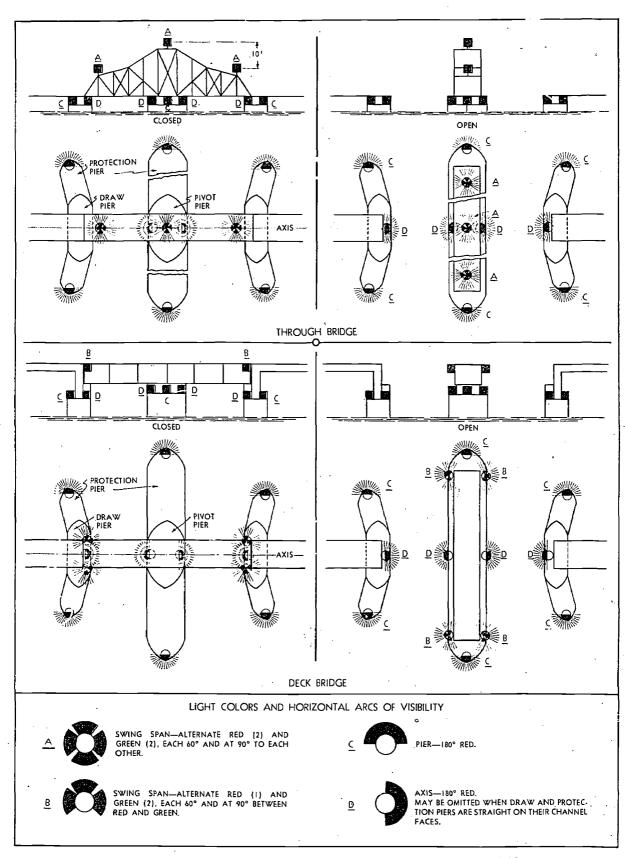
Minimum lighting requirements for double-opening swing bridges.
